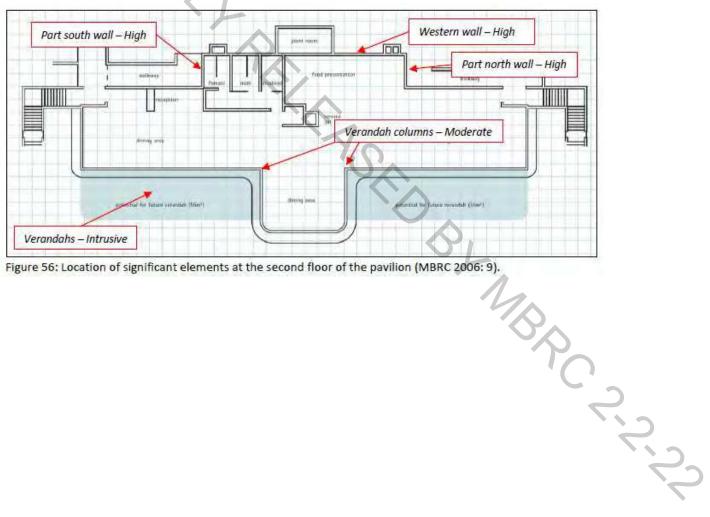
Location of significant elements at the second floor of the pavilion (MBRC 2006: 9).
